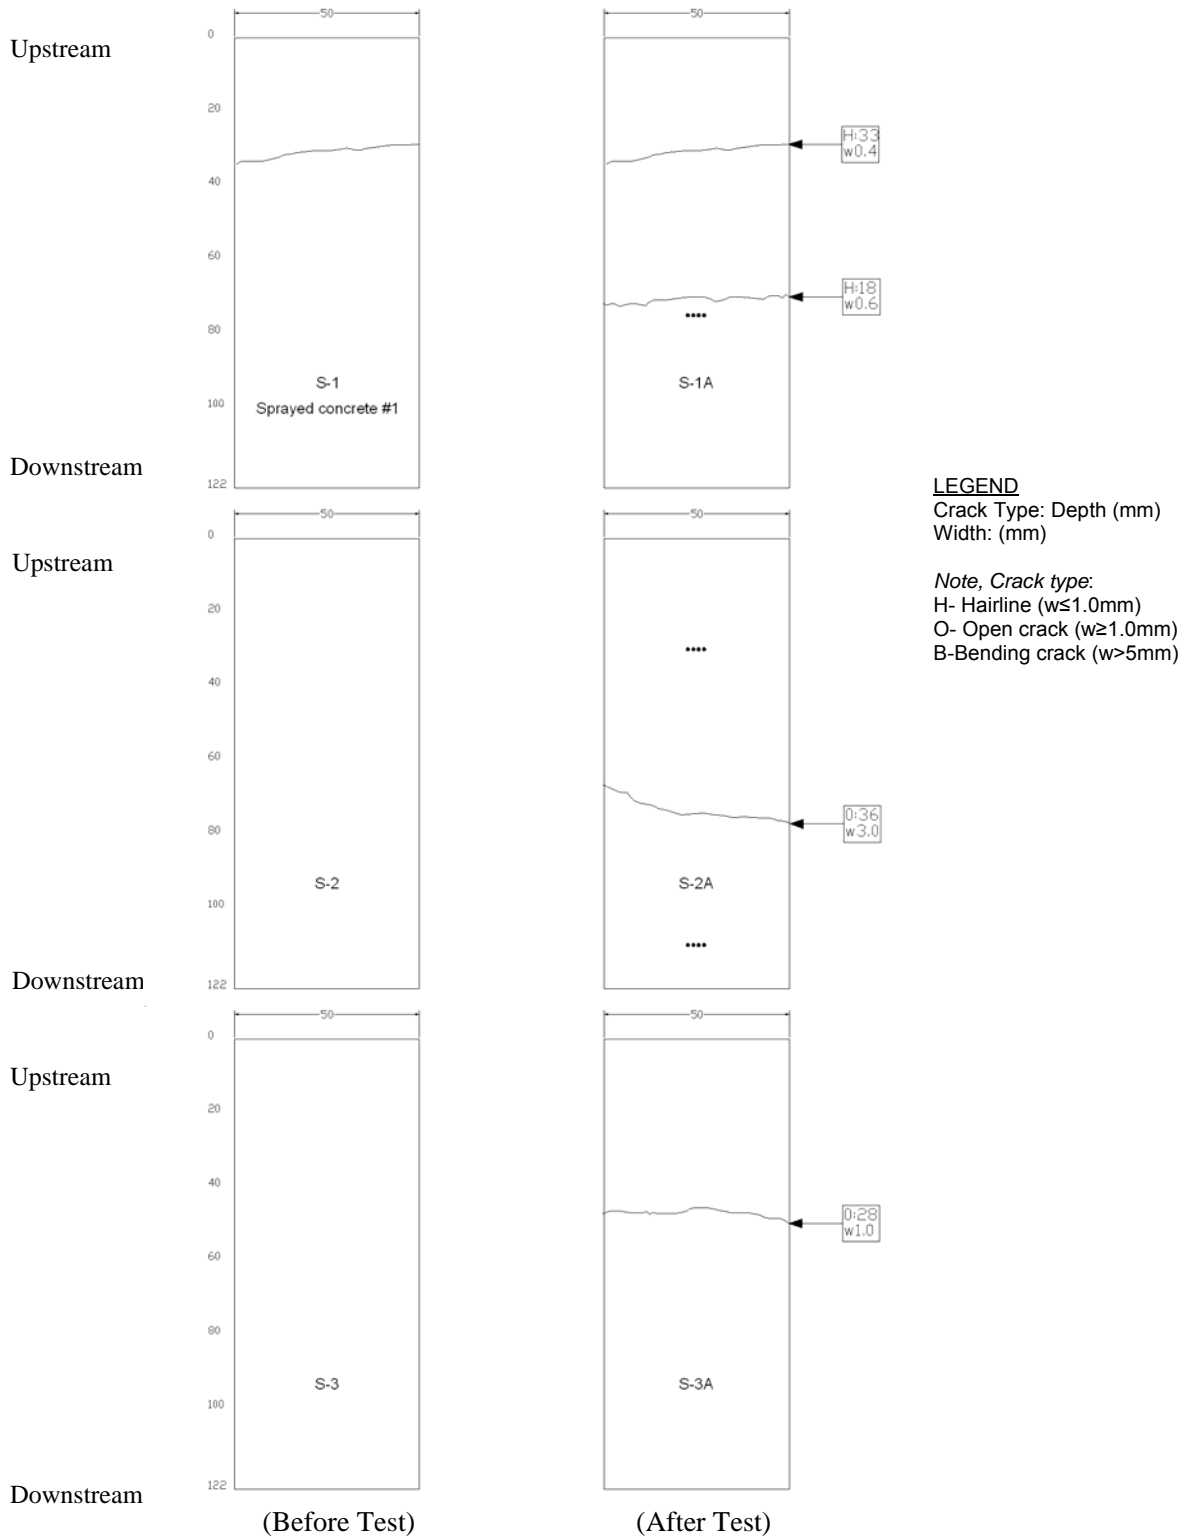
Crack observations-TSL coated concrete slabs S-1, S-2, and S-3
